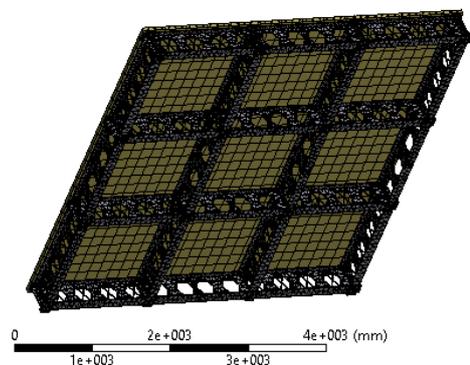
FEM of composite waffle slab by changing I beam into castellated beam with stiffener along shear zone.
